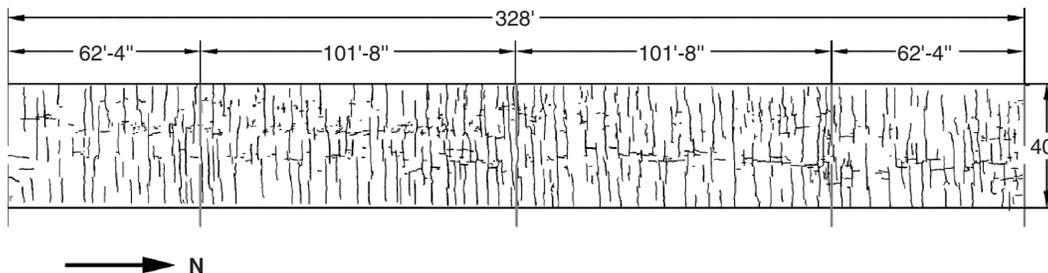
Example bridge deck crack map (6) (1' = 1 ft = 0.305 m; 1" = 1 in. = 25.4 mm).
